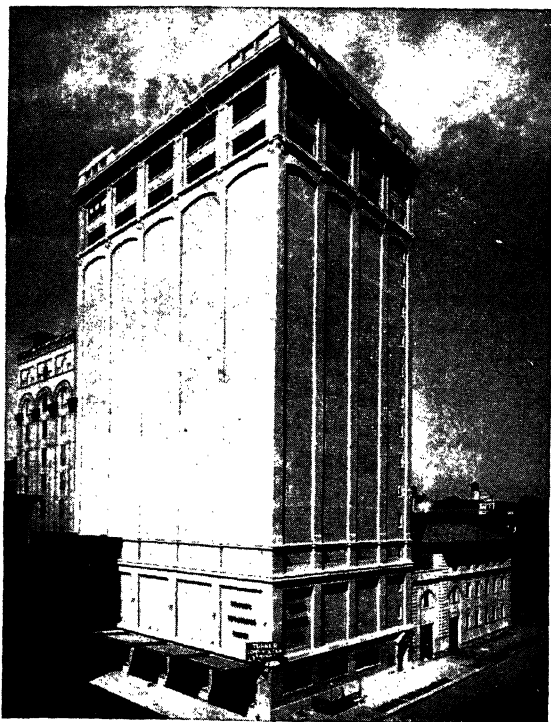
Merchants Refrigerating Company Building, New York City.
